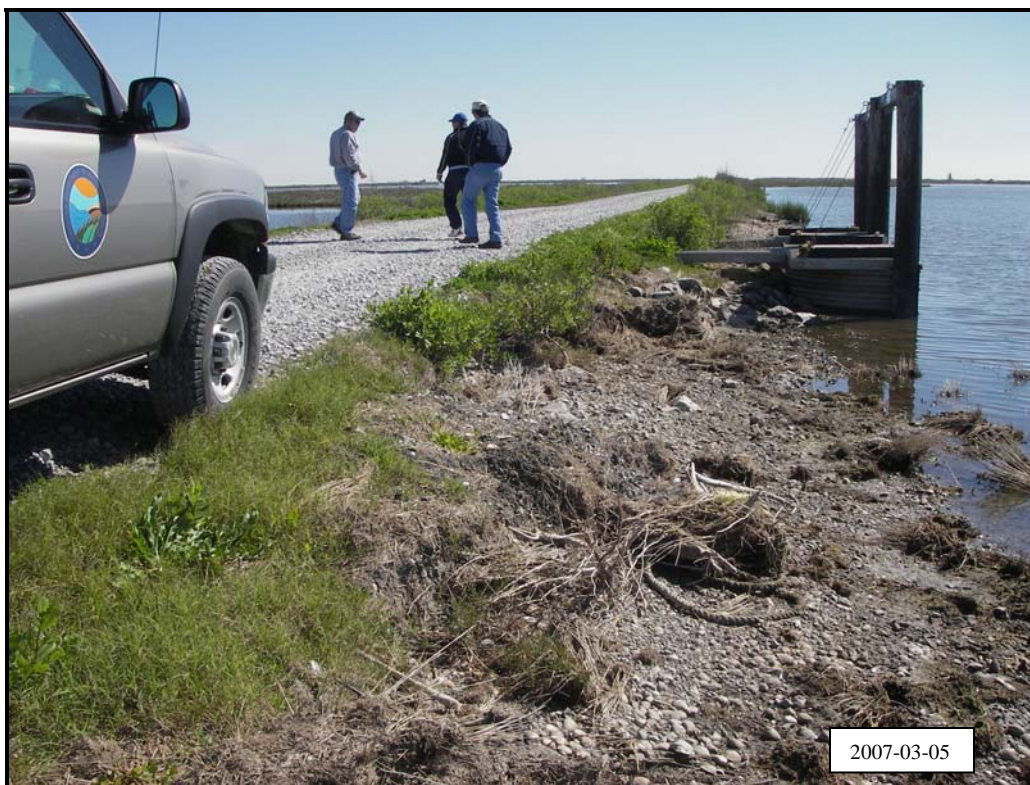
, Structure No. 7, view looking east and showing bank line erosion.
